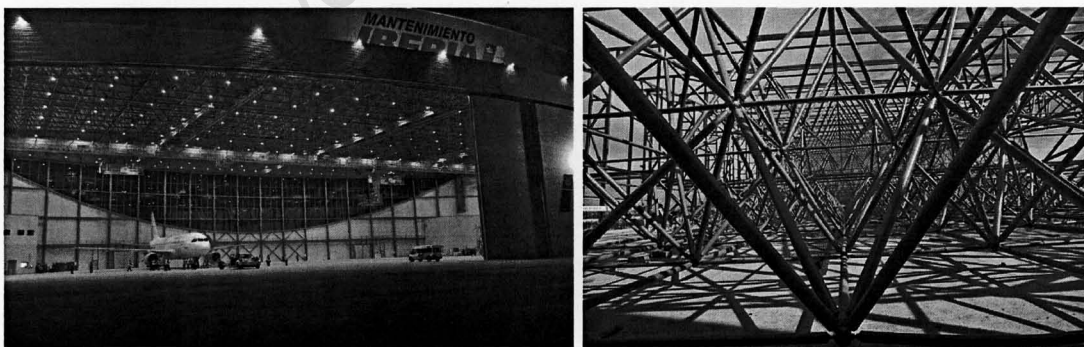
Iberia Airlines maintenance hangar, Barcelona, Spain, consists of a triple-layer grid spanning 150m. The roof is supported at the perimeter by concrete walls, steel columns, and by two steel space truss arches above the main hangar doors (flickr.com, 2010).
